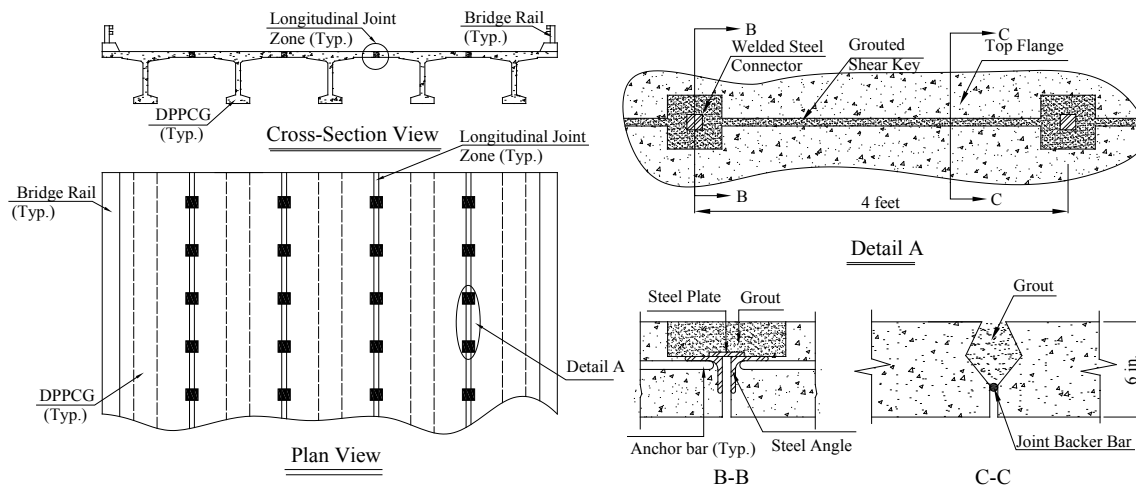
A typical DBT bridge connected by longitudinal joints with welded steel connectors
